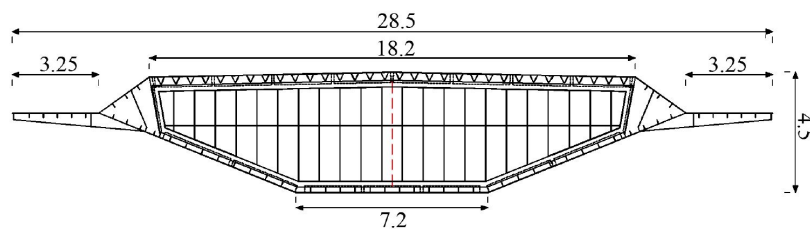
Dimensions of the Humber Bridge box girder section [157].
